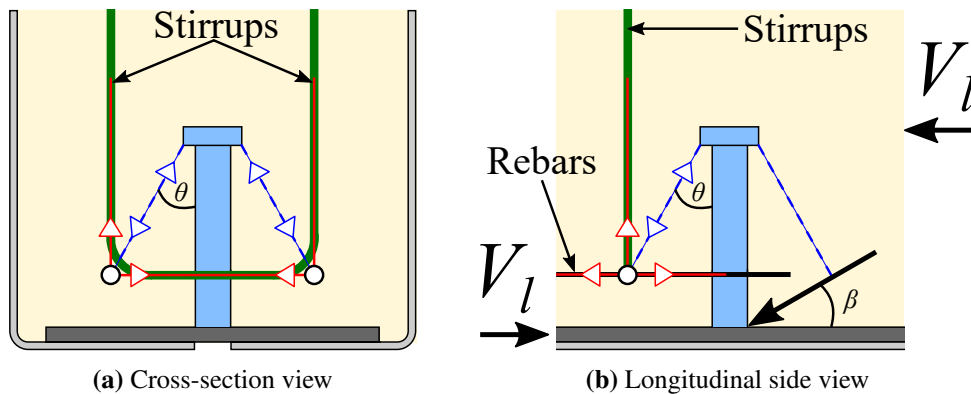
Additional stirrups for a proper load transfer by strut-and-tie model
